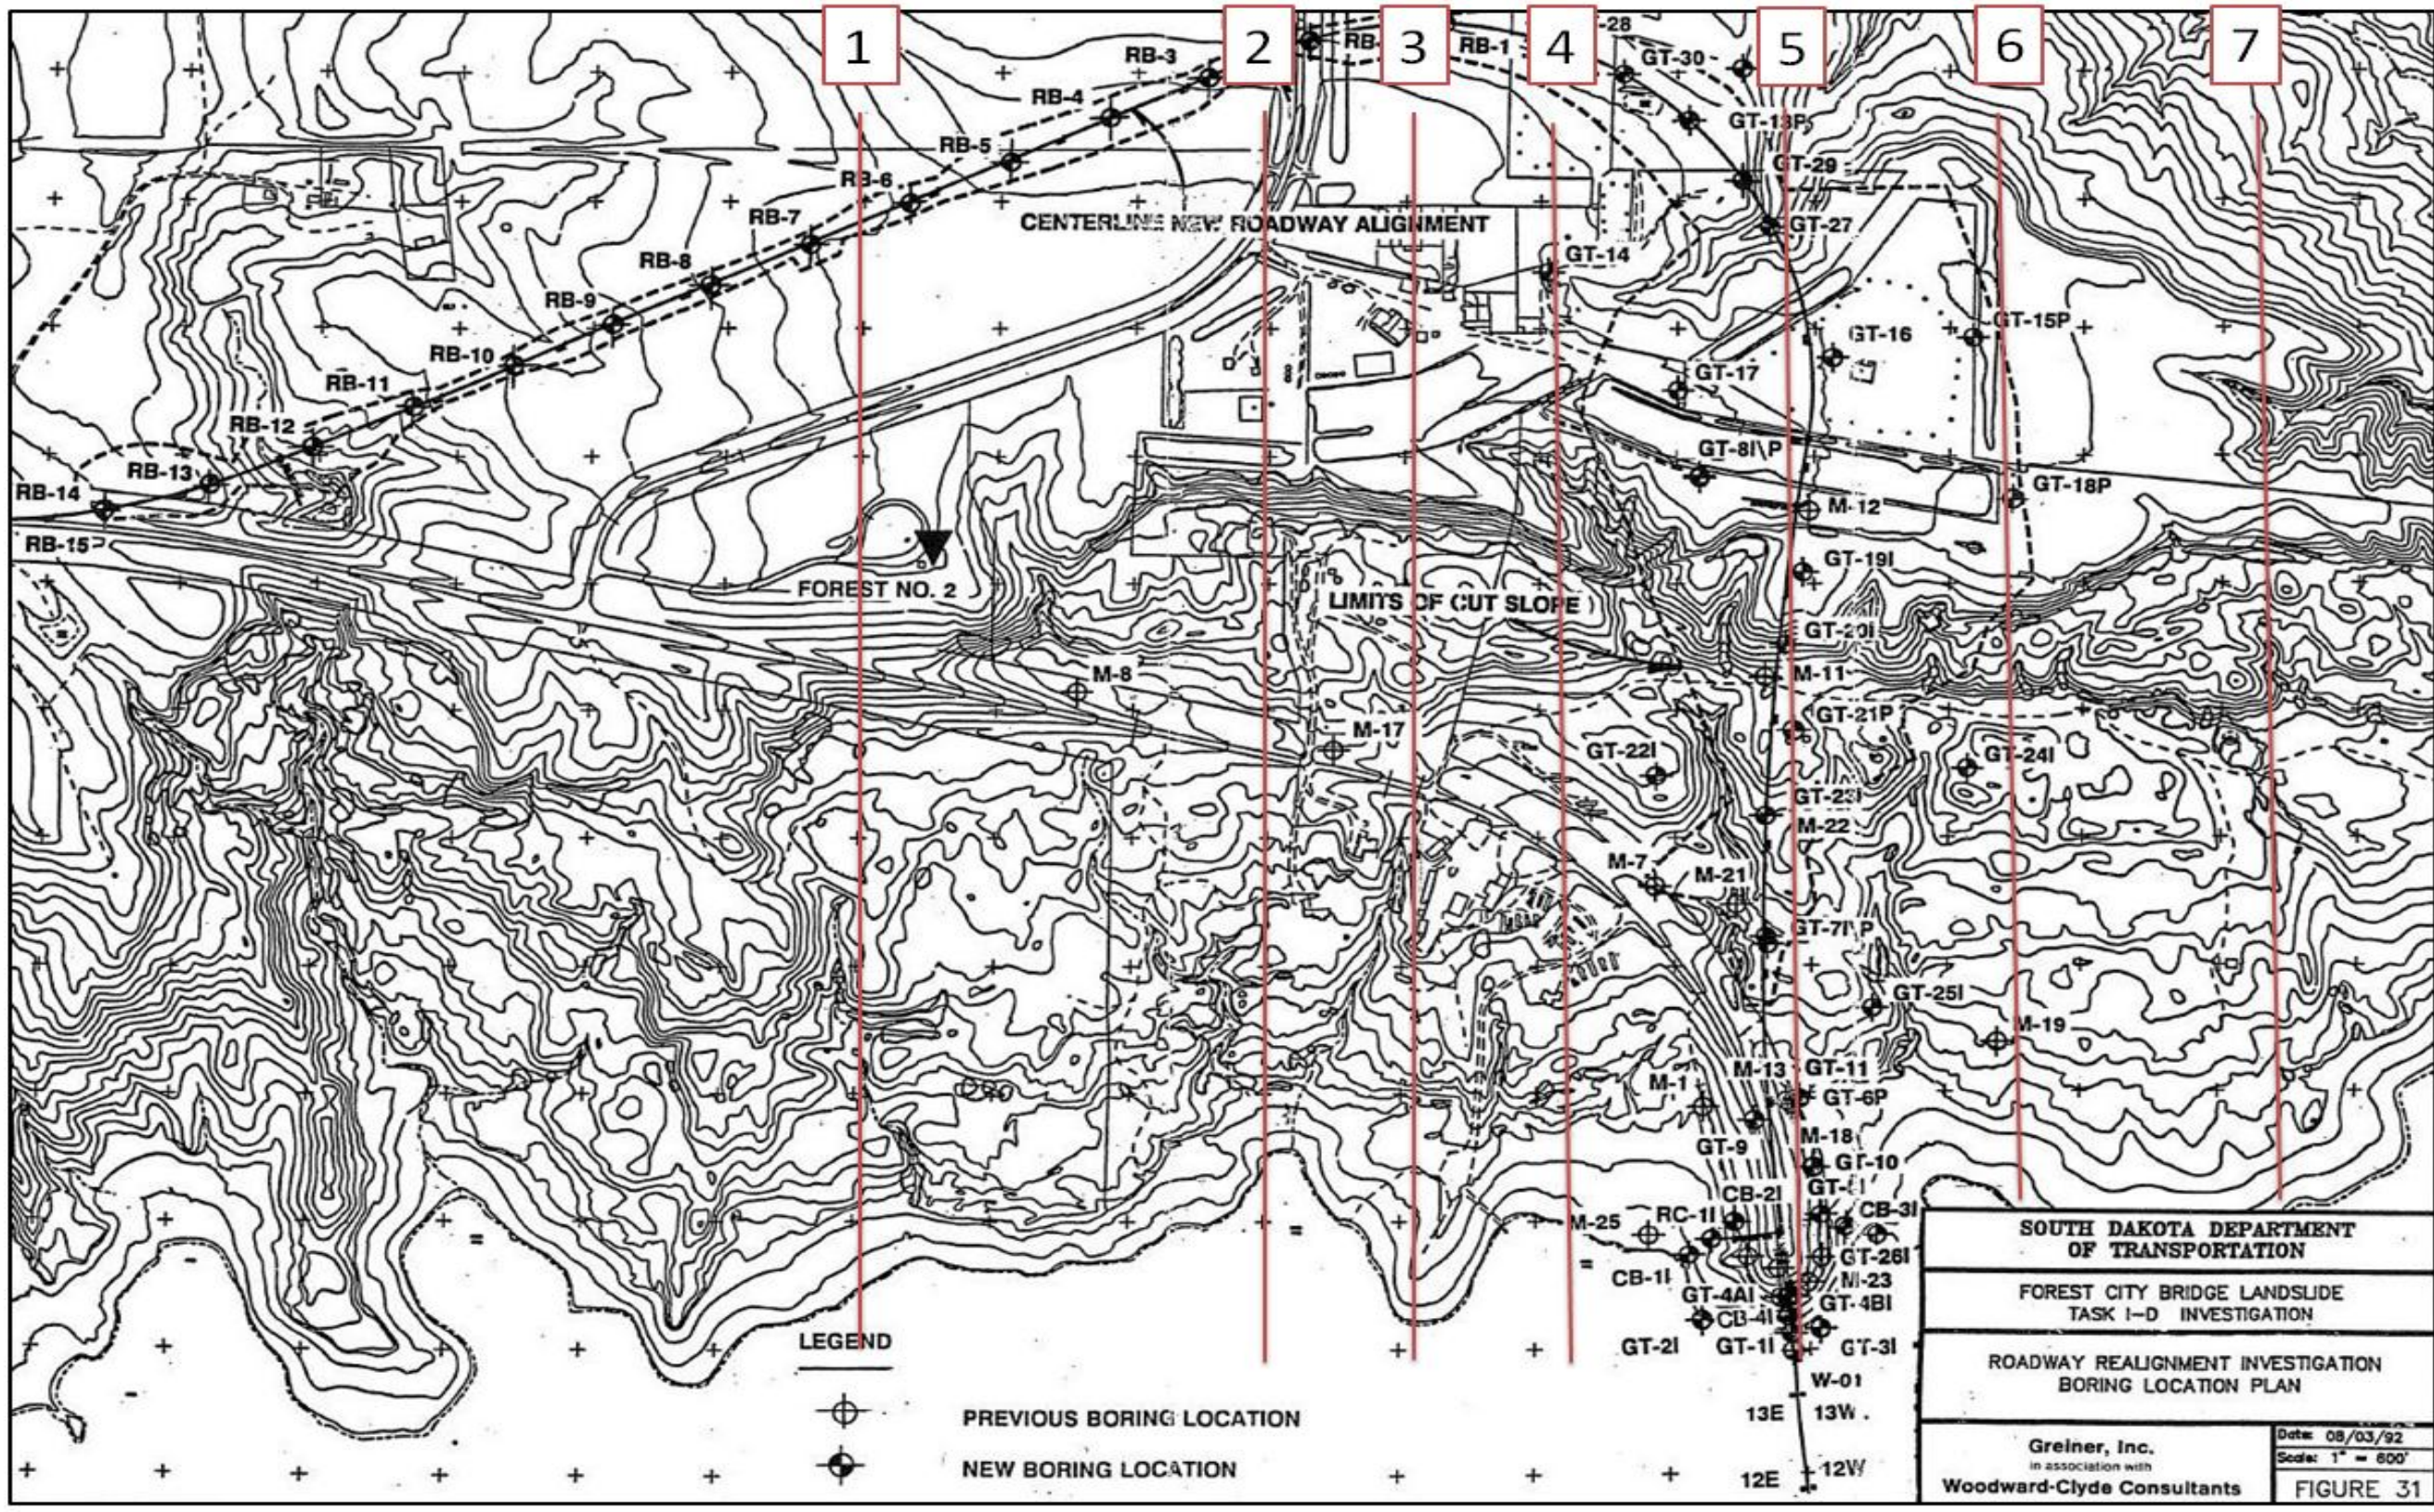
Plan showing the borehole locations and cross sections selected for the 3D analysis using CLARA/W (adopted from Grenier and Woodward Consultants 1991) (not to scale)
